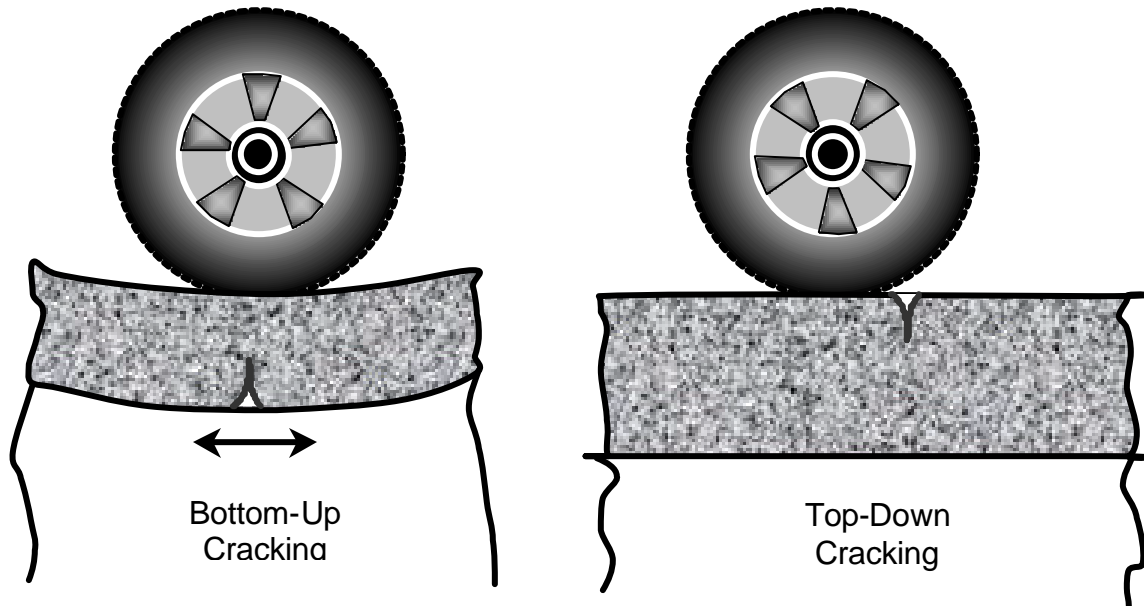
Development of Fatigue Cracking In Asphalt Pavements
